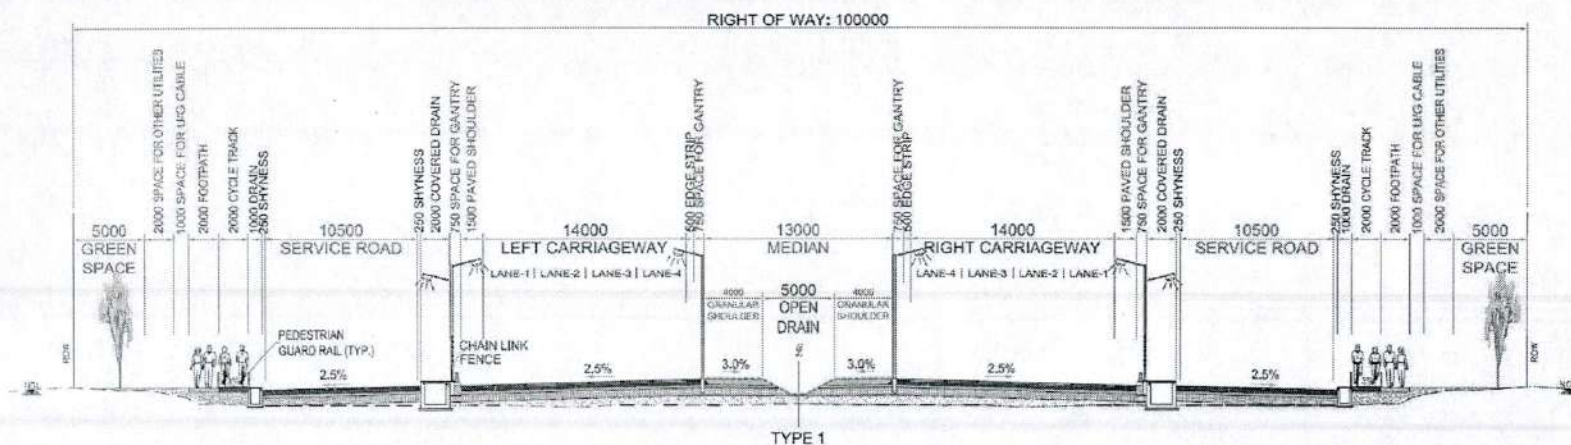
Typical cross section (at grade) of the proposed PRR showing various elements
